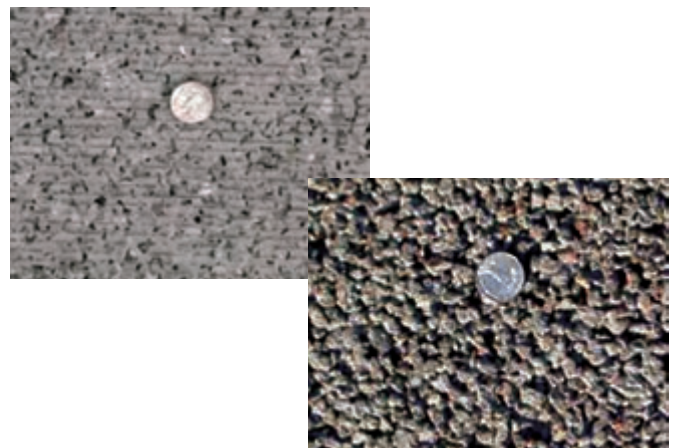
Photos of ground and unground porous concrete pavement.¹⁴⁶
